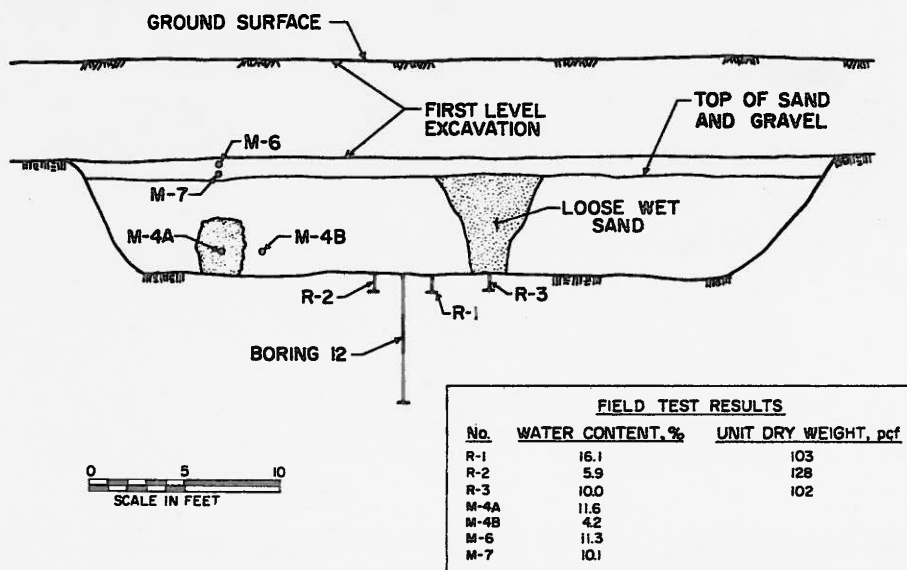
PROFILE THROUGH TEST PIT SHOWING WEST FACE
